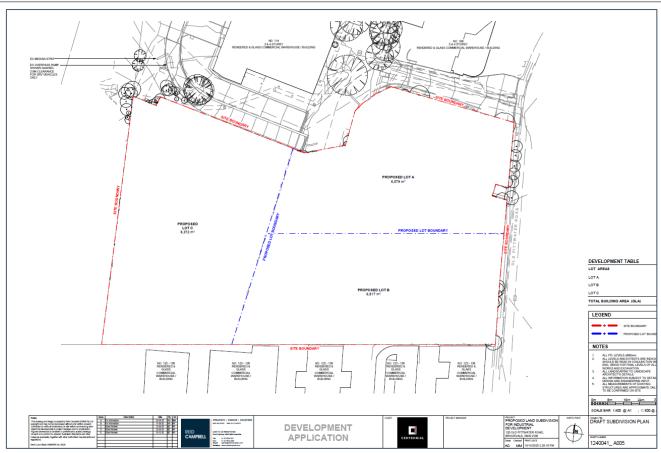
Subdivision plan indicating Lot A, Lot B, and Lot C (Source: Reid Campbell)
